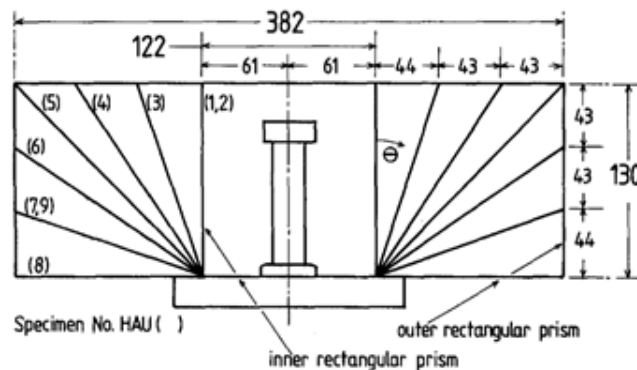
Sloped Haunch (Oehlers and Park 1994)
